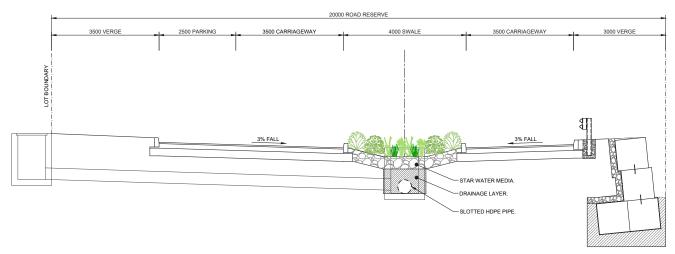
Boulevard Retention Swale - Typical Drainage Section (Source: Craig & Rhodes)
